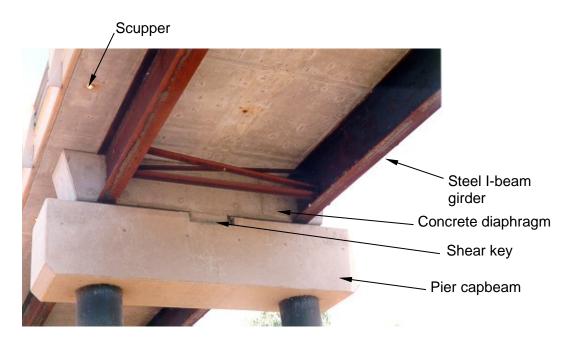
A(2) - STEEL I-BEAM/CONCRETE COMPOSITE SUPERSTRUCTURE
